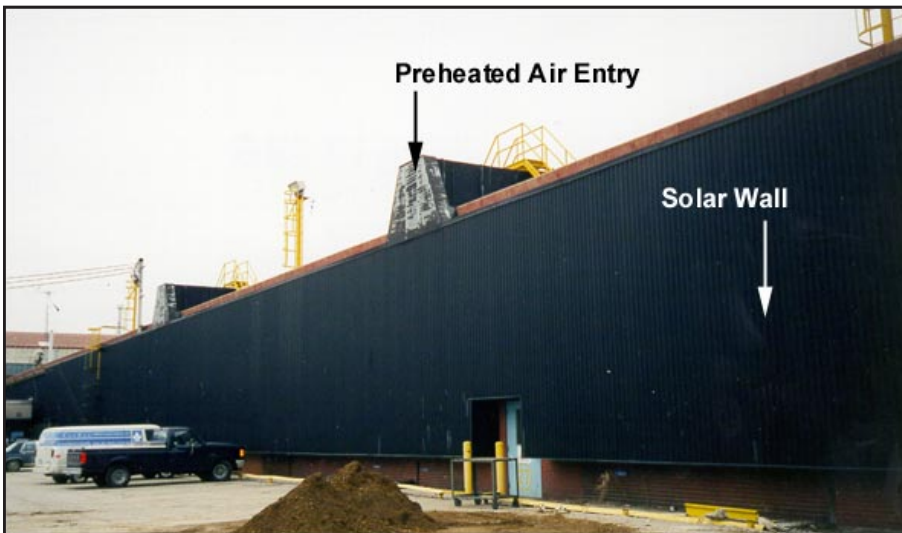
A huge 10,500-square foot solar wall on the Ford Ensite Engine plant in Windsor, Ontario. The original wall was unattractive, required insulation, and was in need of recladding prior to the solar wall installation, which improved the economics of the installation. This is one of eight solar wall installations on Ford Motor Company plants in the United States and Canada.
